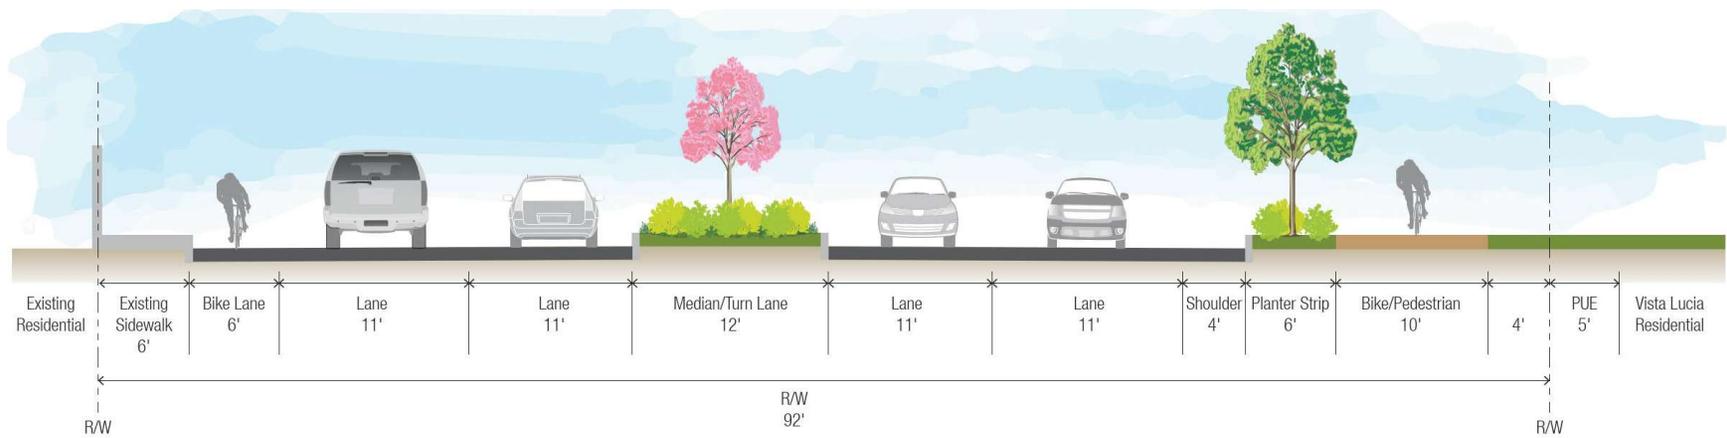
4-Lane Arterial Typical Section--Fanoe Road north from Vista Lucia southwest property boundary to Burgundy Way Looking North
